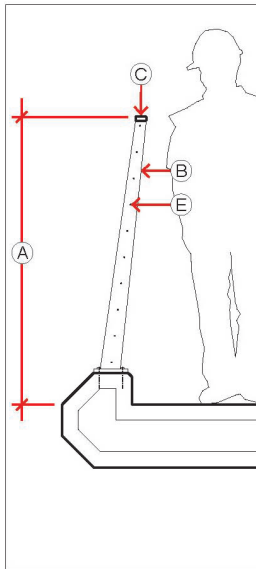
Pedestrian railing type 1 typical section
